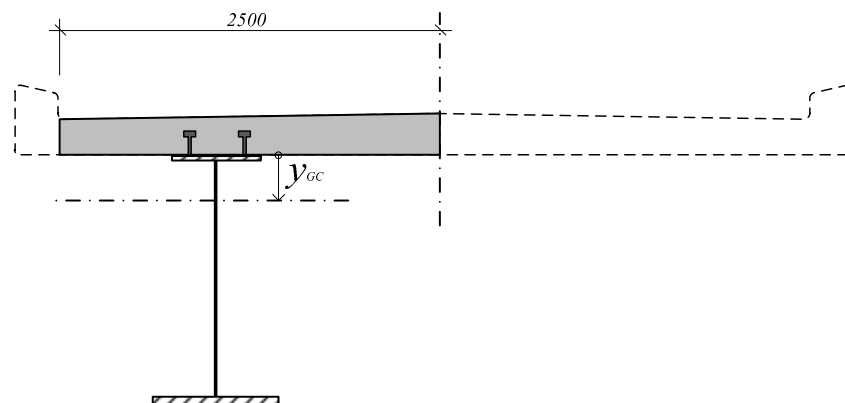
Bridge cross-section adopted in calculating the relevant cross-section properties for fatigue verification
